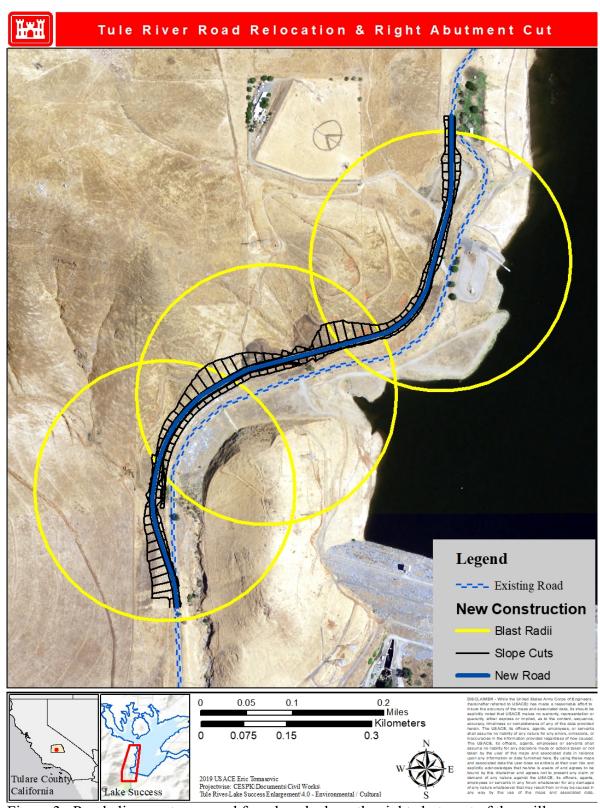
Road alignment proposed for a bench along the right abutment of the spillway.
